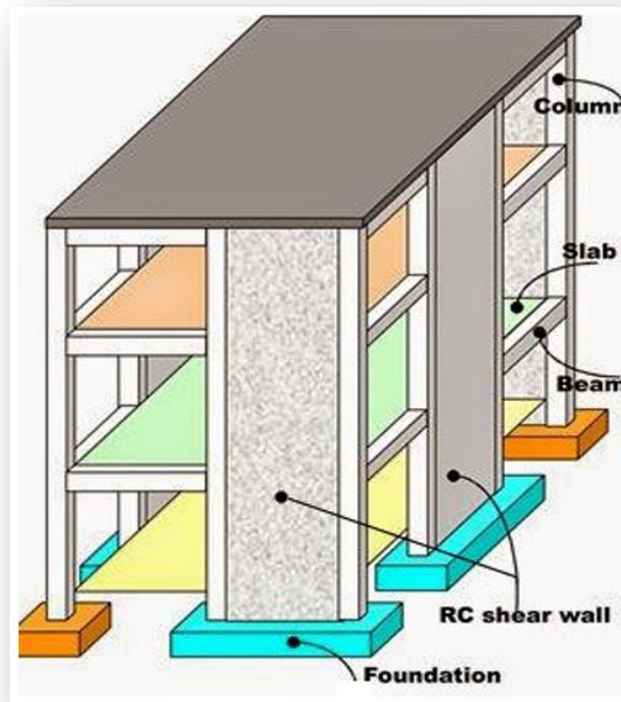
Different geometry of shear wall (Source: www.civisnapshots.com)
